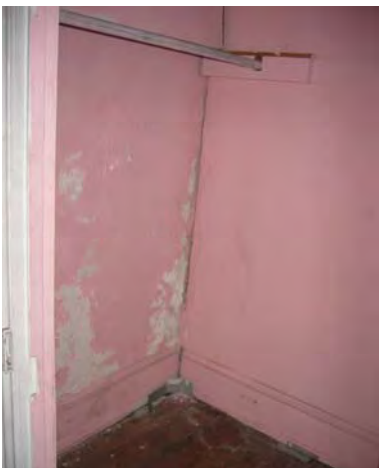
Partial south and west walls. (Photo: BBB, 2007)
